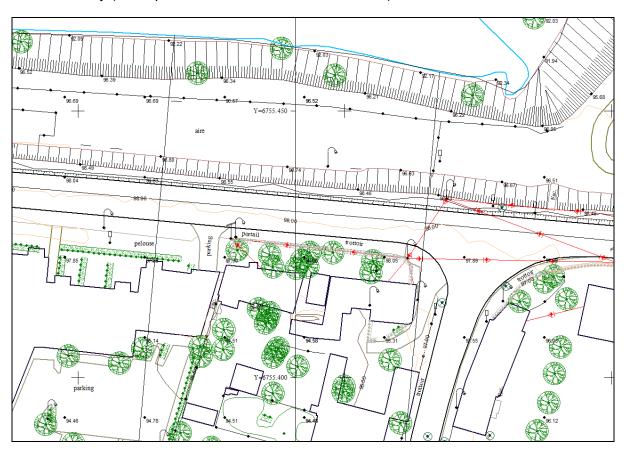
Example of 1/500 Topographic Plan on Capucins Levee
